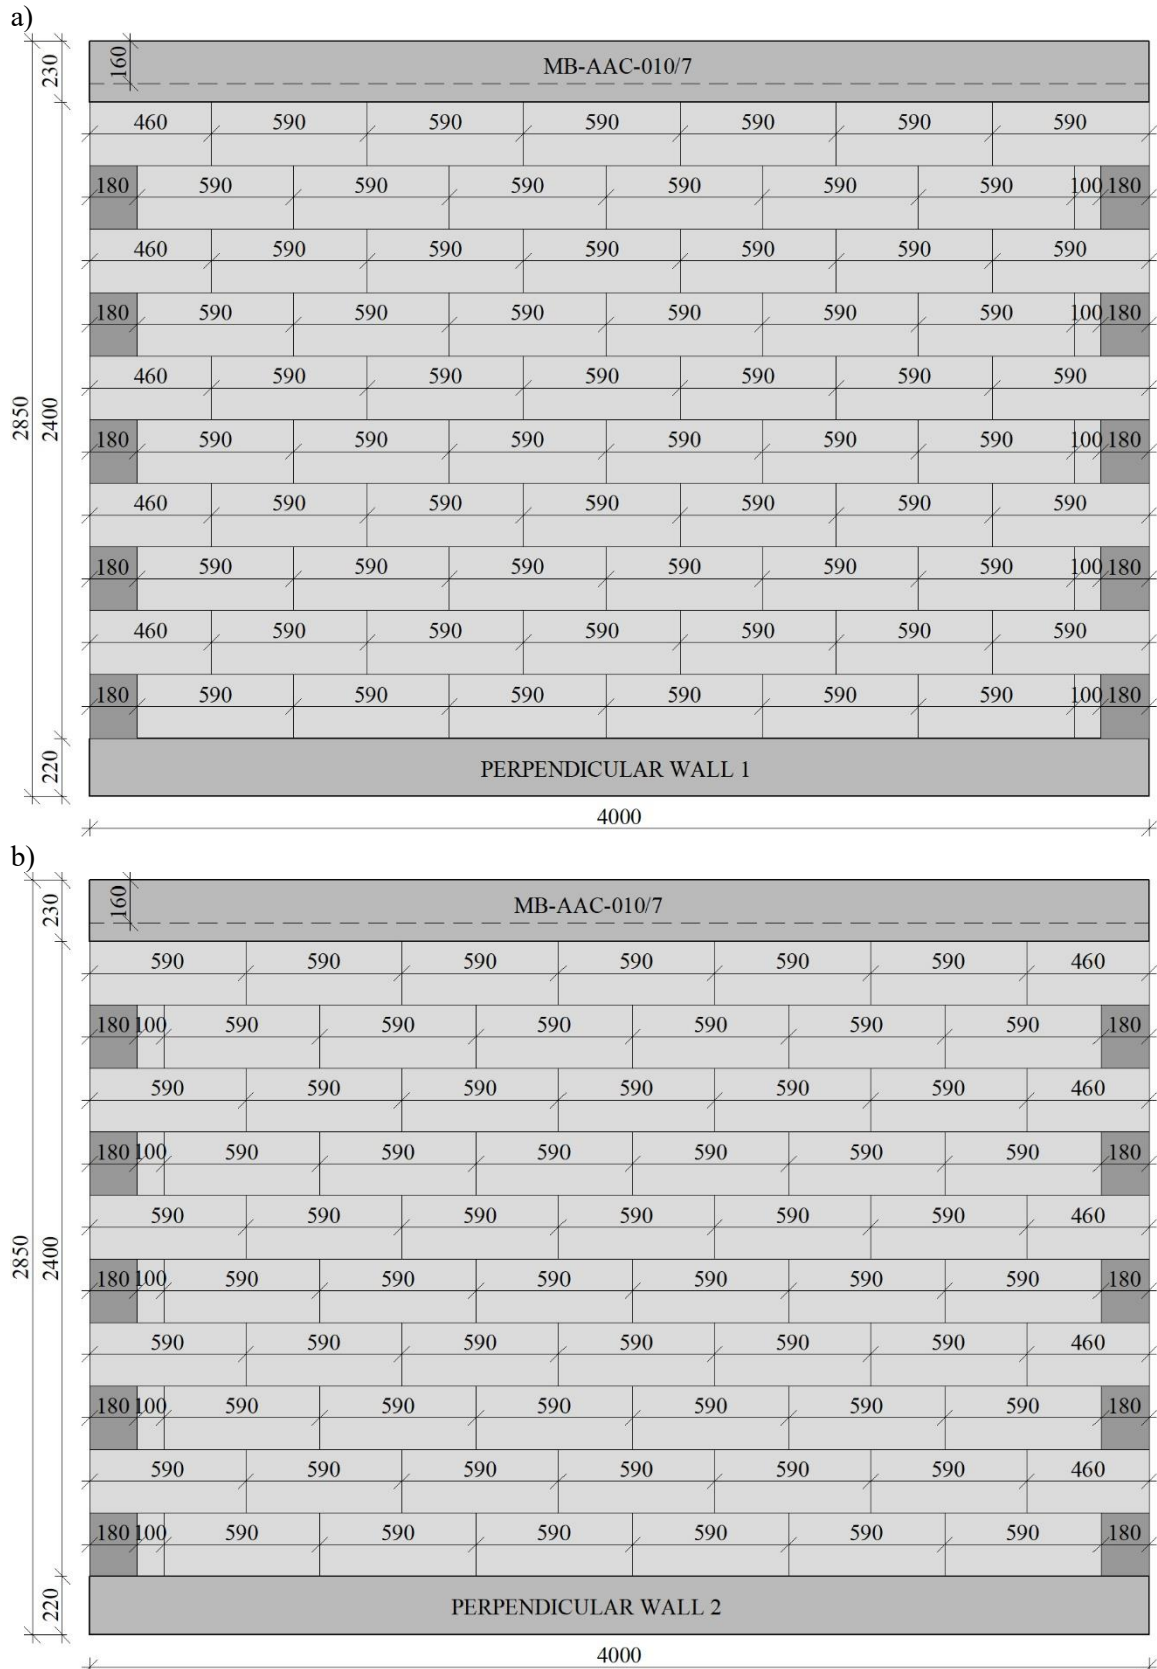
Design of the MB-AAC-010/7 model: a) perpendicular wall 1, b) perpendicular wall 2
